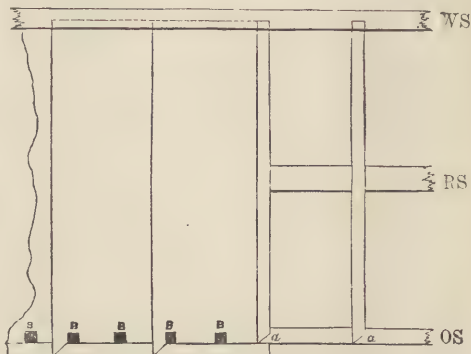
Plan. Scale, $\frac{1}{2}$ inch = 1 foot.
